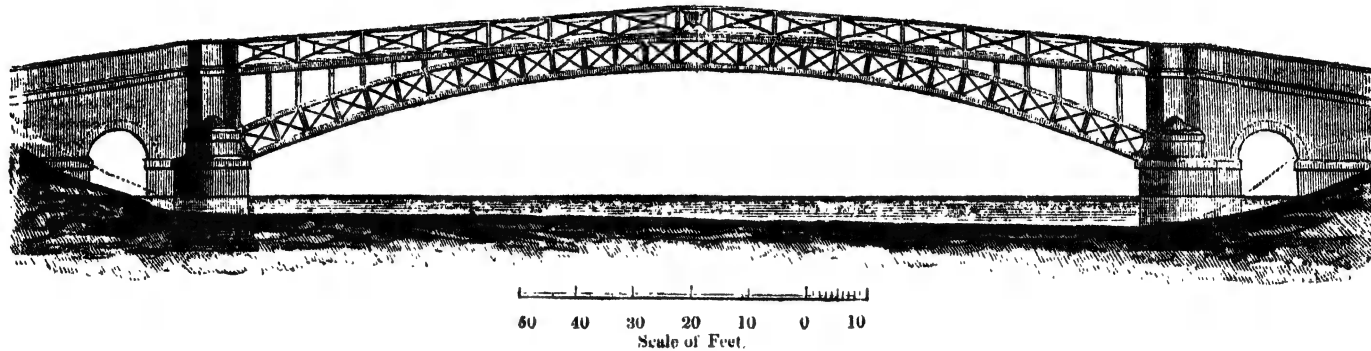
Section of Bridge and Elevation of Abutment Pier.
